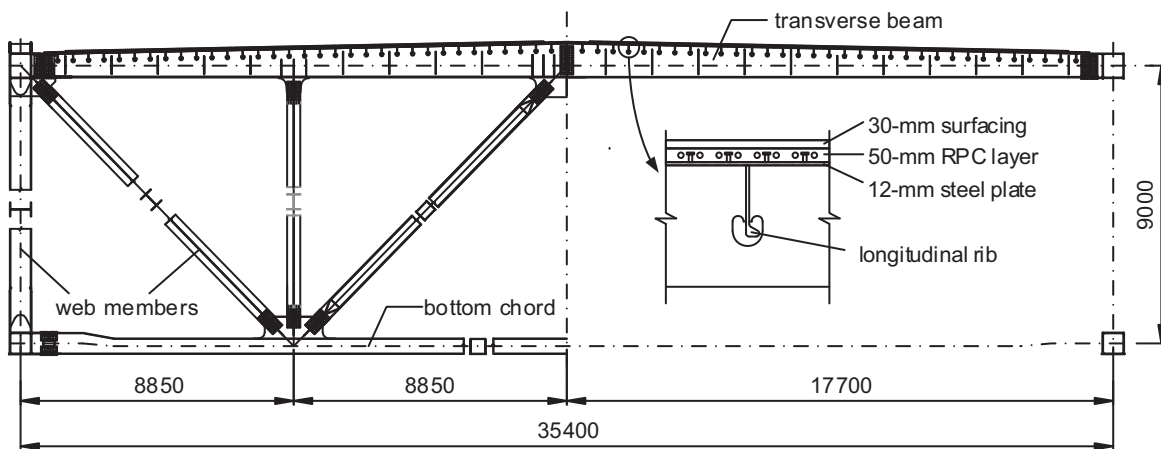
Typical girder cross section of Dongting Lake Second Bridge (Note: All dimensions are in millimeters)
